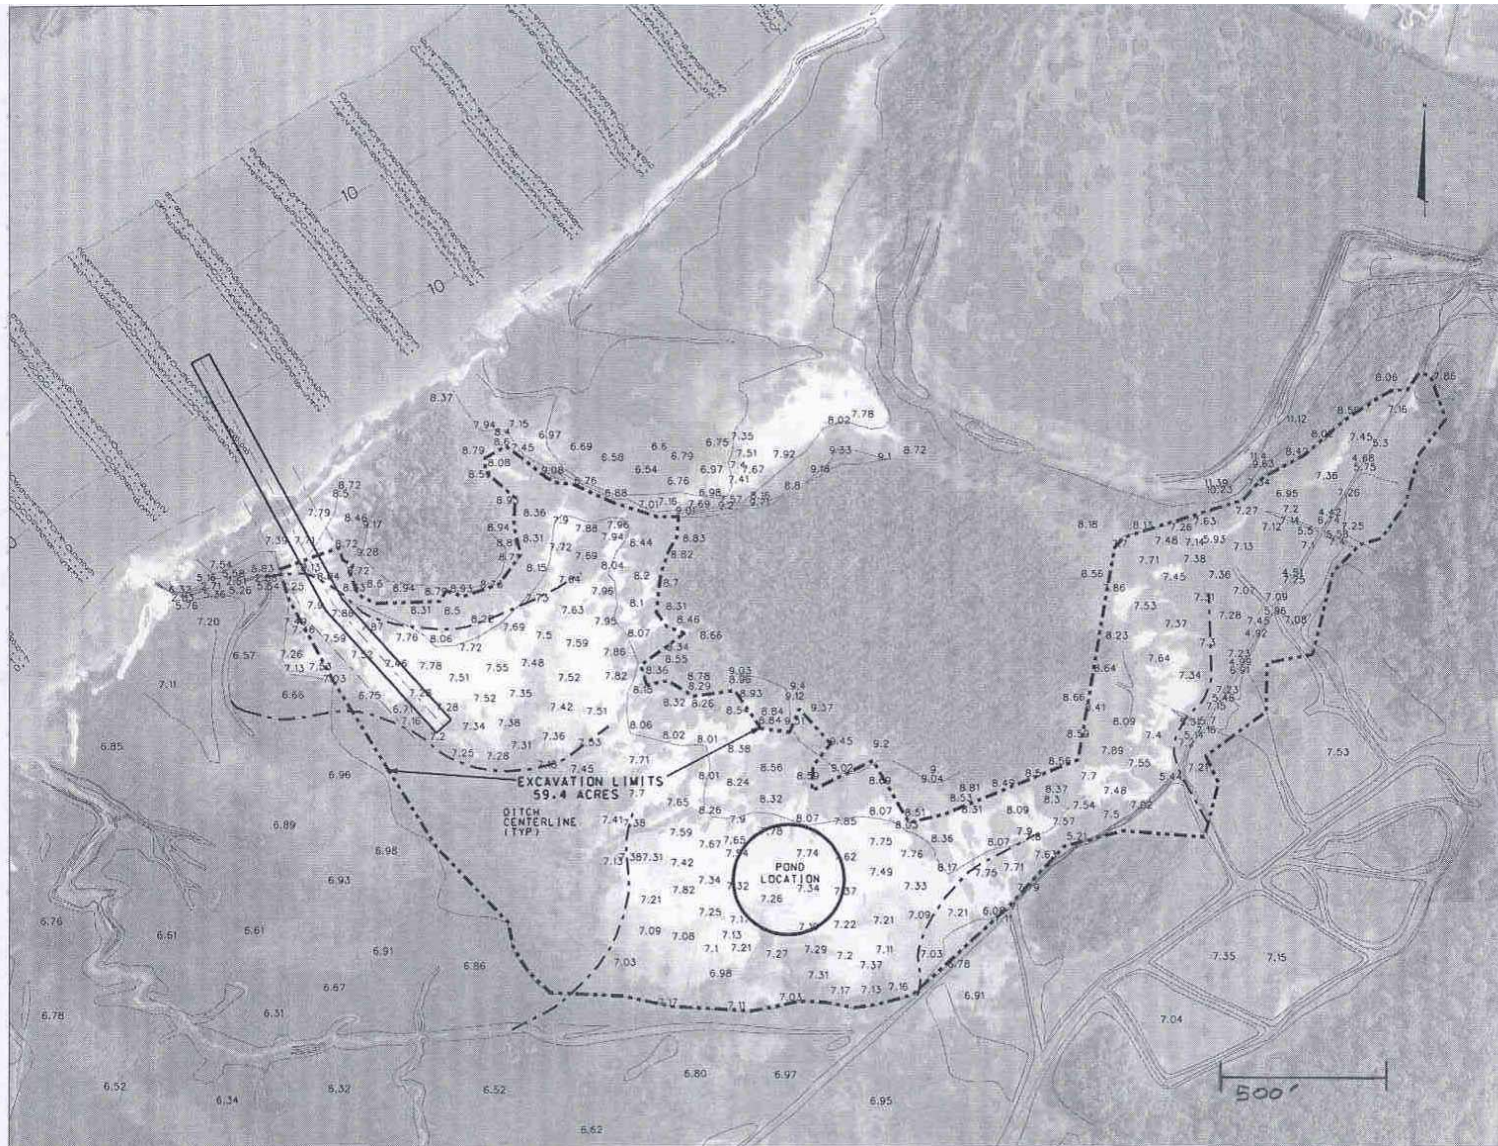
Wetland Mitigation Plan and Proposed Barge Canal
